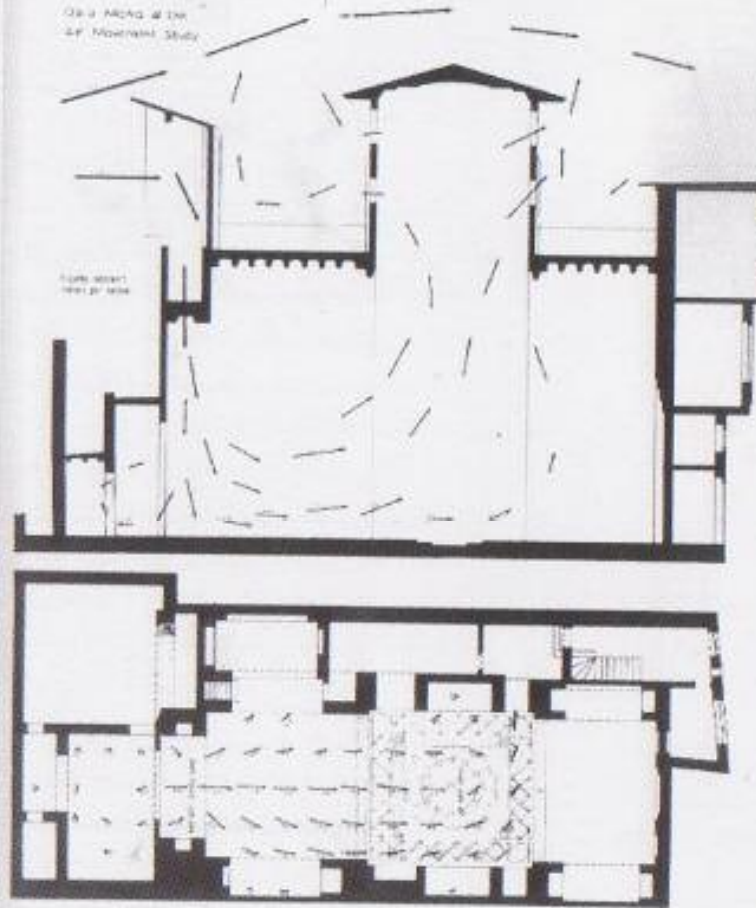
Section at the 2nd floor level. Plan of Beit el-Sit.
